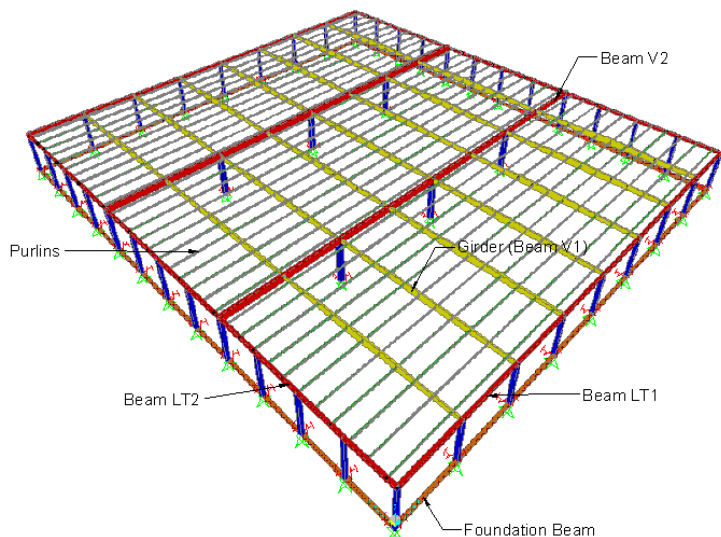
General aspect of the precast structure in study identified as columns P1, with a cross section of 0,40x0,40m², are located on the façade of the structure. P2 columns are also located on the façade of the structure, but have a cross section of 0,45x0,45m² and are supporting V2 beams. Finally, columns P3 present a 0,60x0,60m² cross section and are located inside the structure, also supporting V2 beams.
